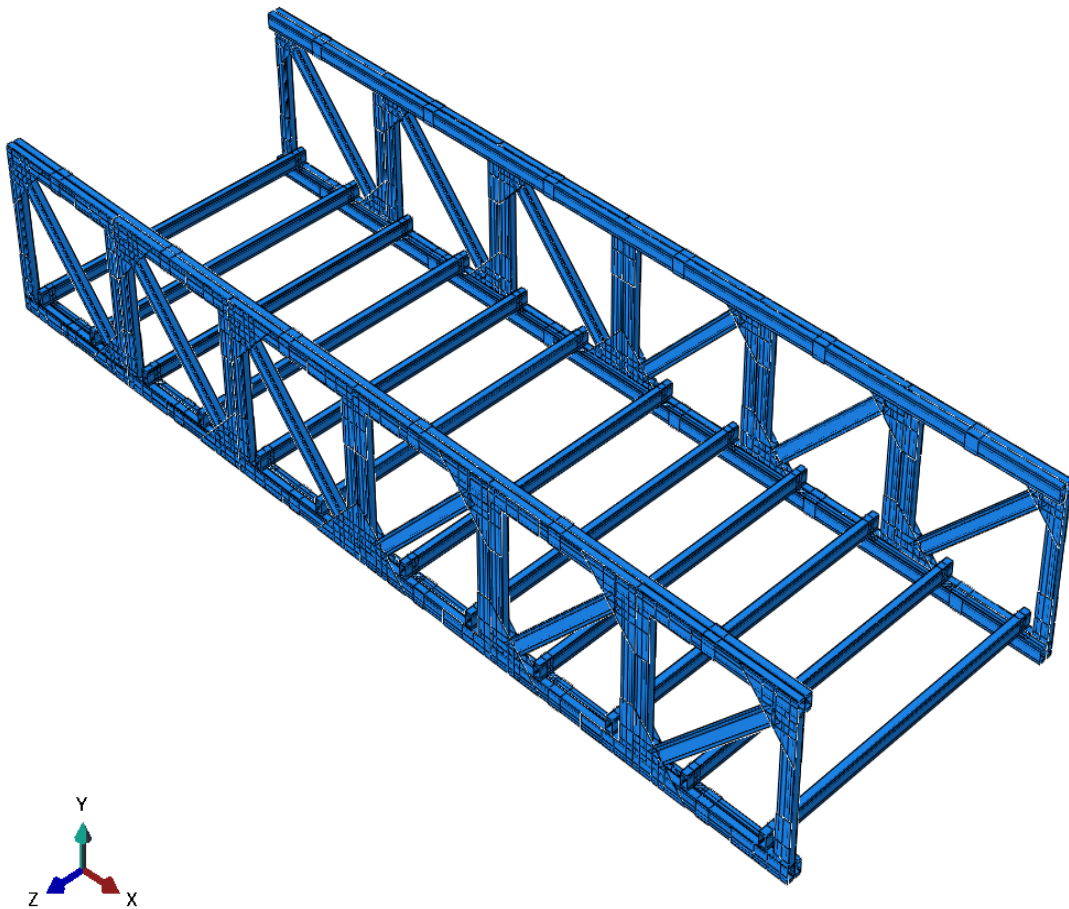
shows the design and geometry of the modular panel truss bridge model.
